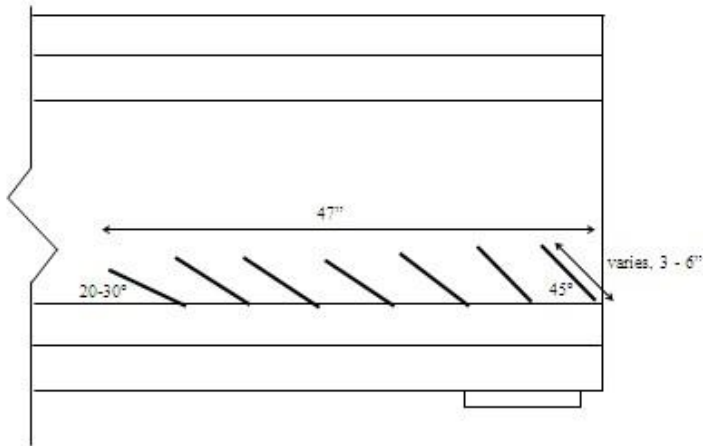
Crack Diagram For Exterior Girder, West Side, West Face, South Abutment (Bridge 16, #9728).
